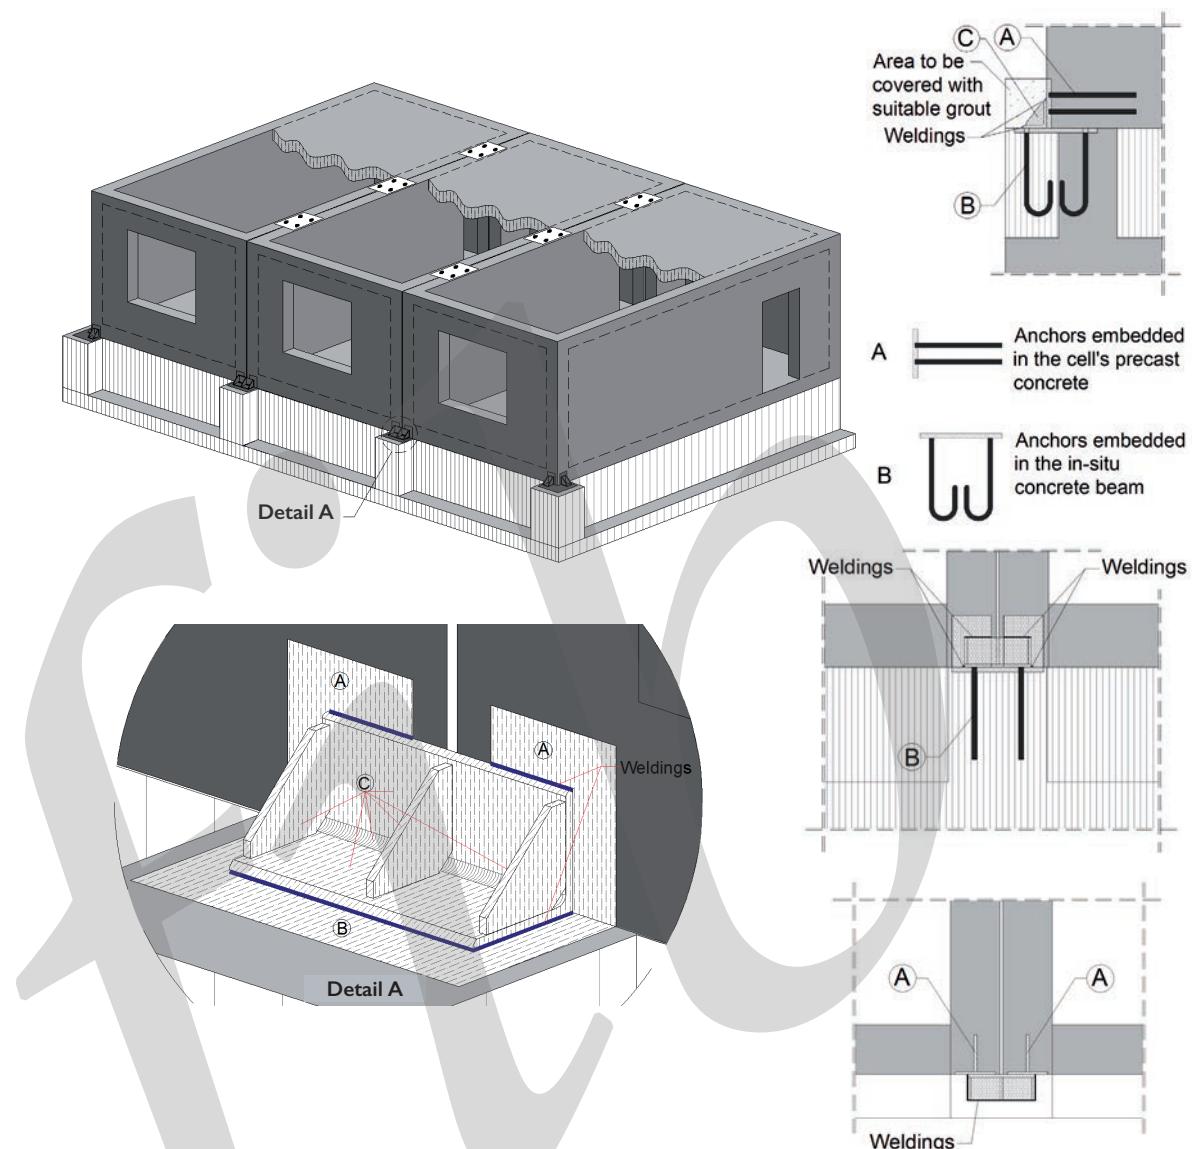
Connections of cell units with strip foundation (other reinforcements not shown for clarity) (Manolatos et al., 2003)
